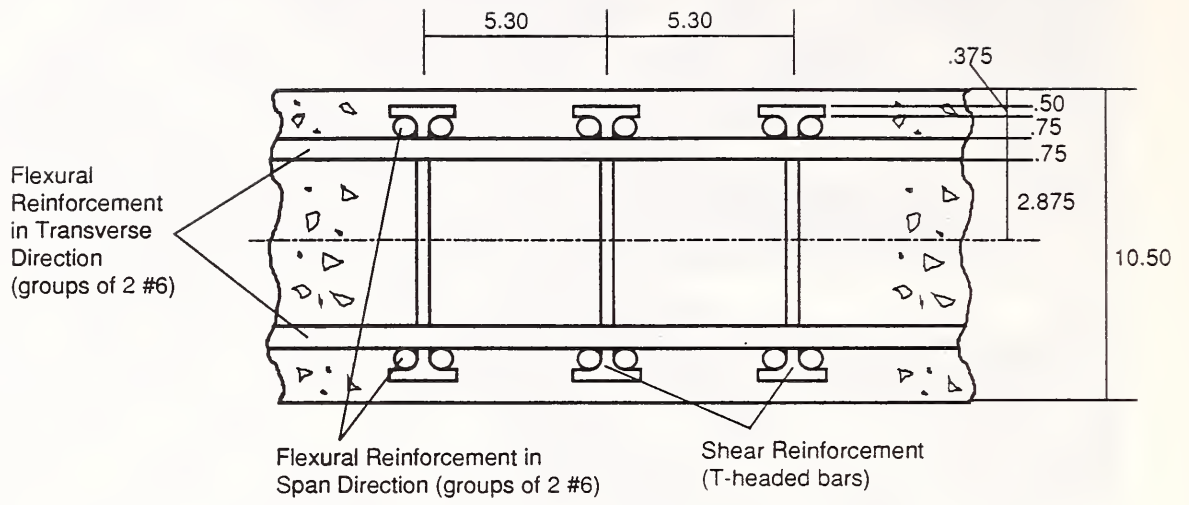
Arrangements of Flexural and Shear Reinforcements in the 1/6- and 1/4-Scale Specimens
